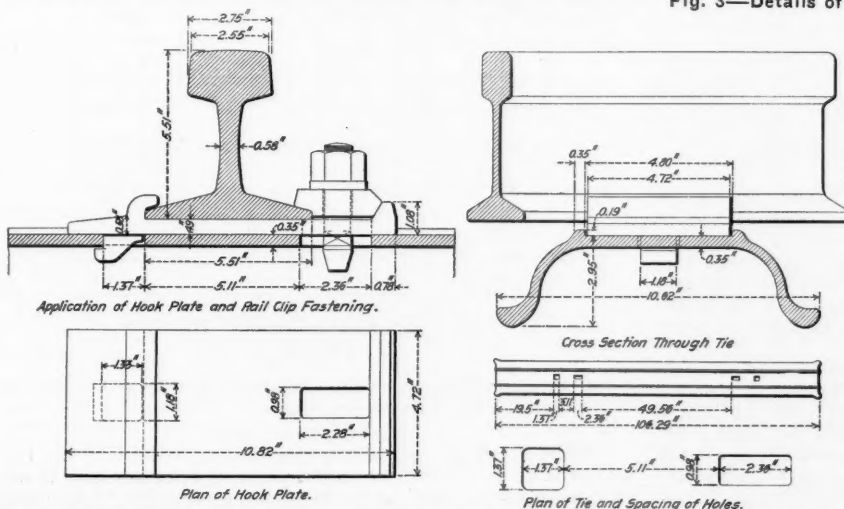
Haarmann Steel Tie and Hook Adapted to American Track.
